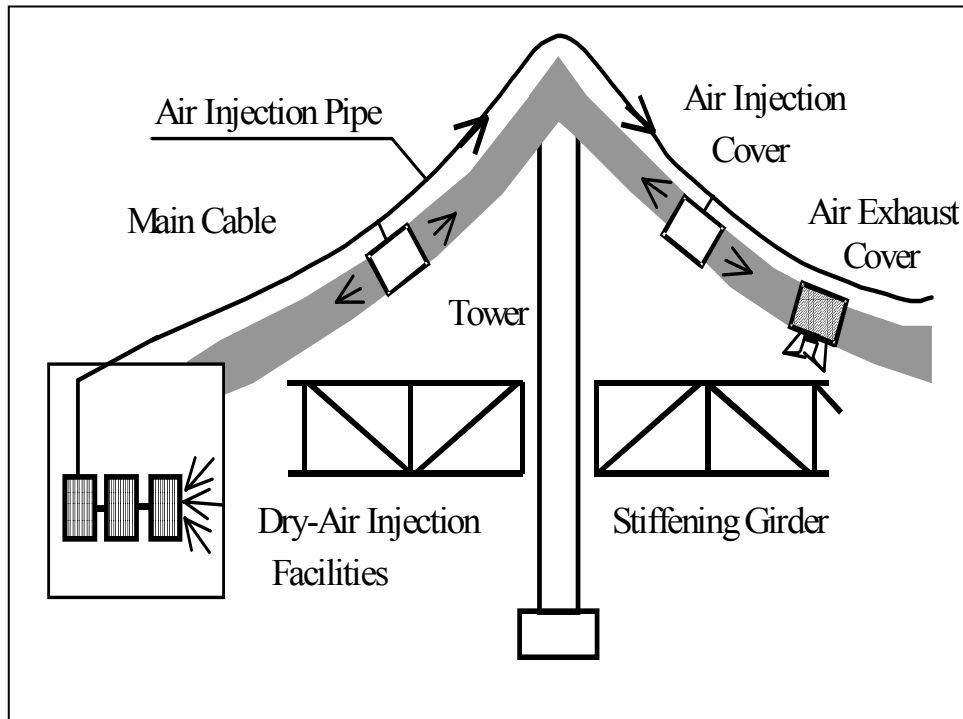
Layout of dry-air injection system for the Ohnaruto Bridge
